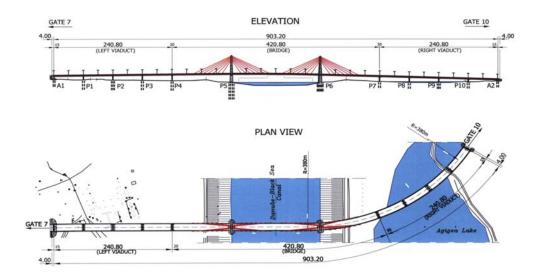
Elevation and plan view of the bridge in accordance with the initial solution
